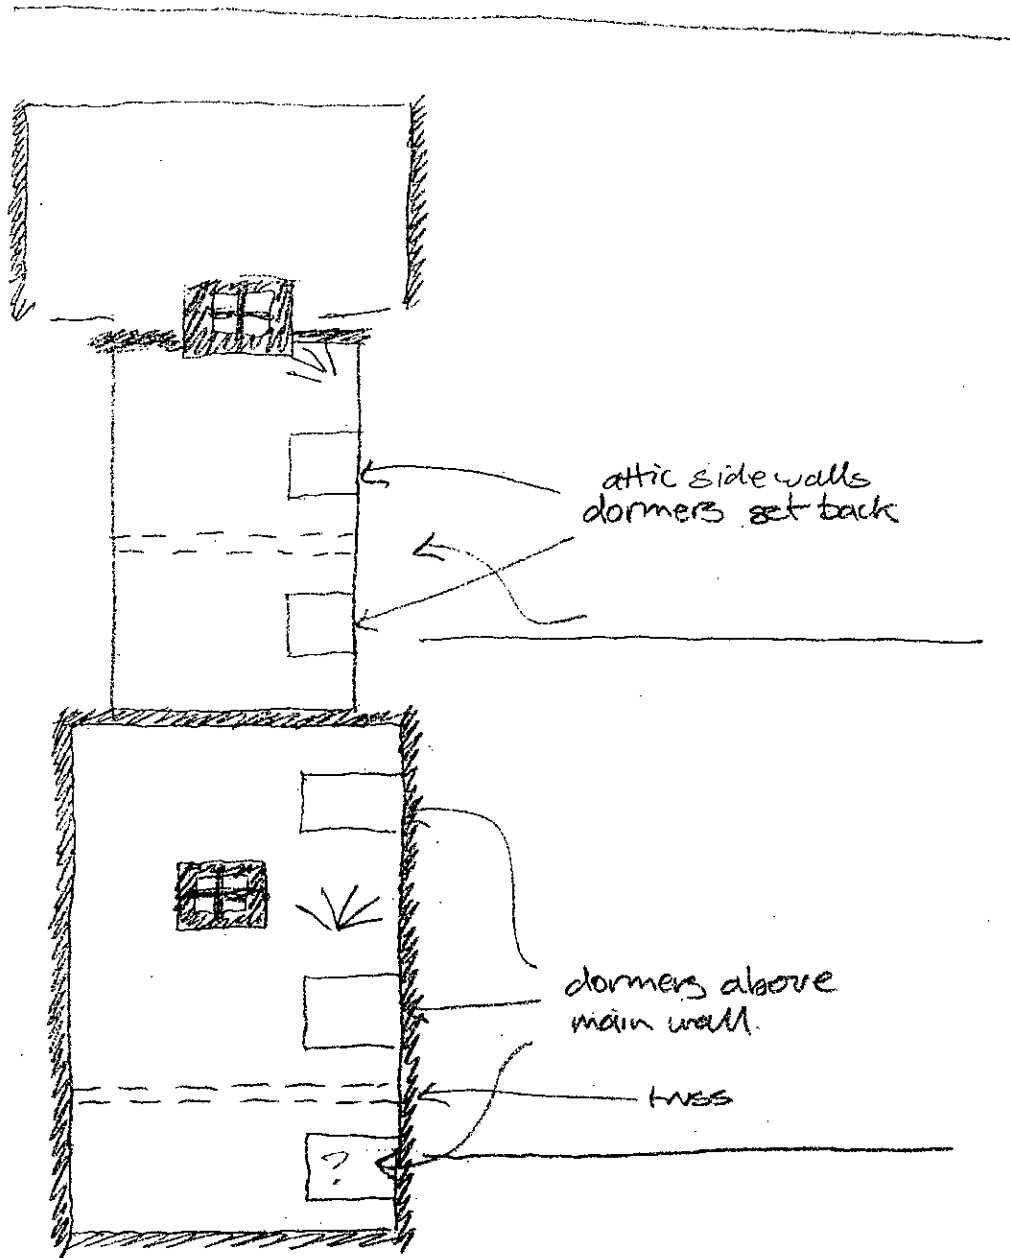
; sketch reconstruction of the seventeenth-century attic floor plan.
